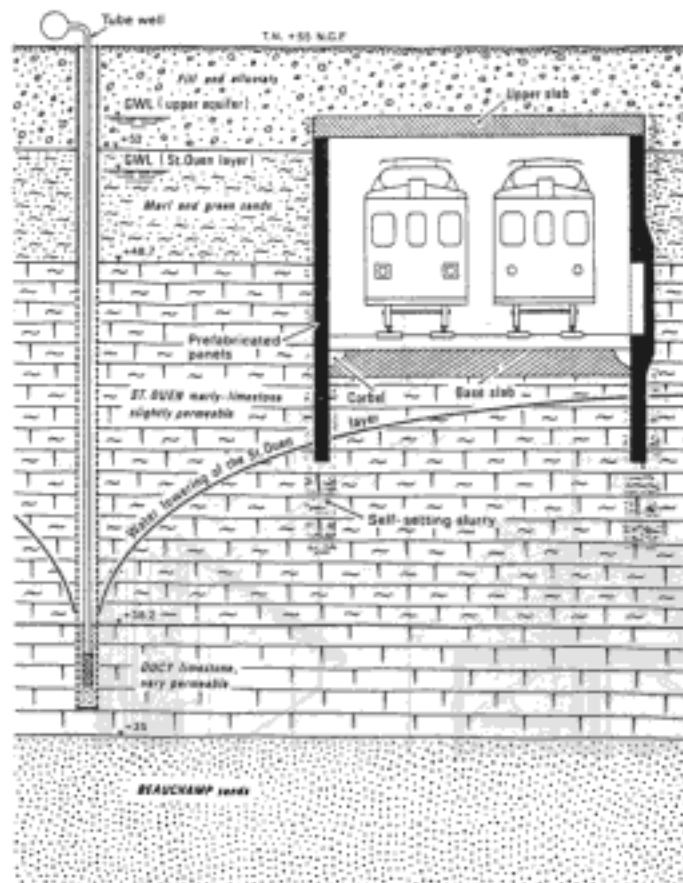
Cross-section of precast diaphragm wall construction for the rail link to Charles de Gaulle Airport, Paris (courtesy of Soletanche)
